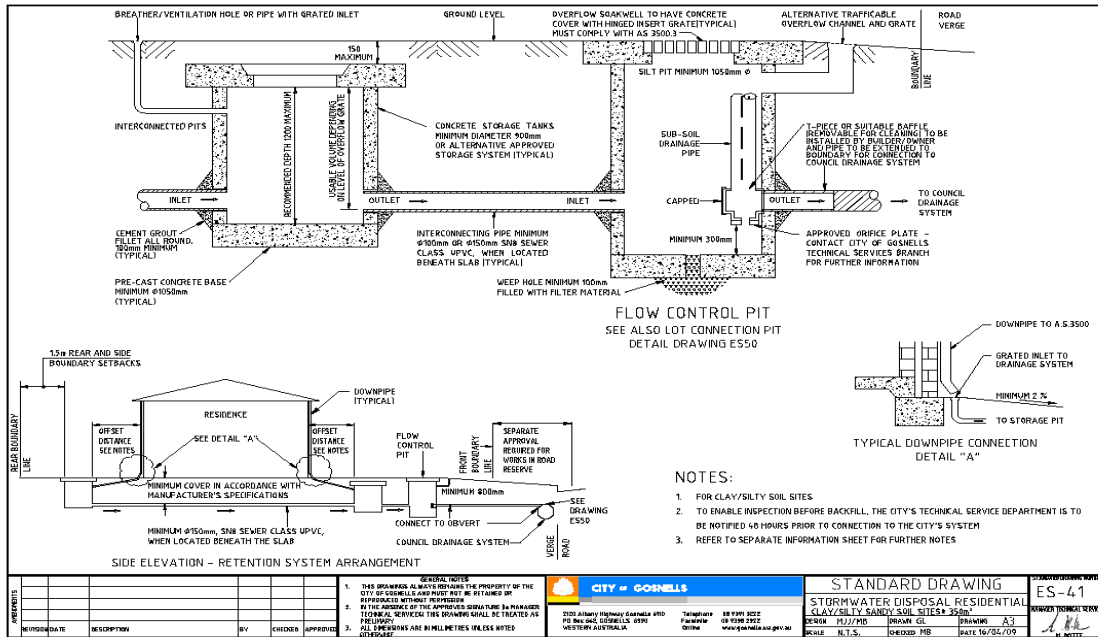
Details of inter-connected circular concrete tanks and flow control pit: low-permeability sites
